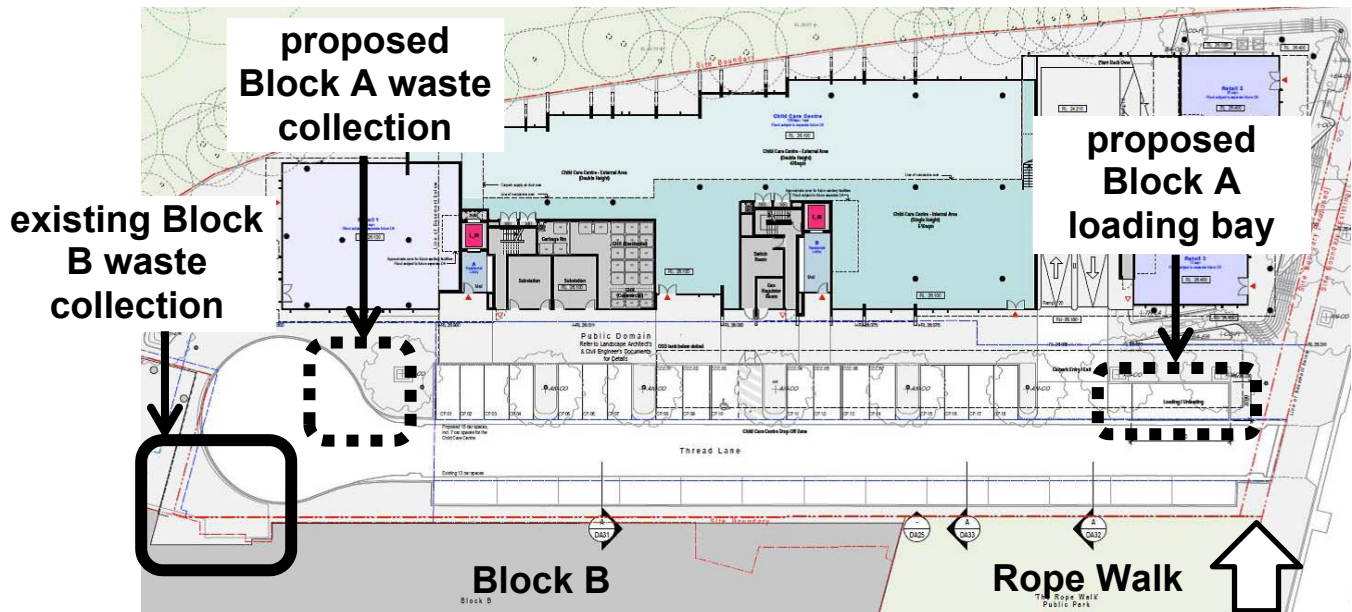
Diagram illustrating the locations of the proposed and existing waste collection and proposed loading bay.
